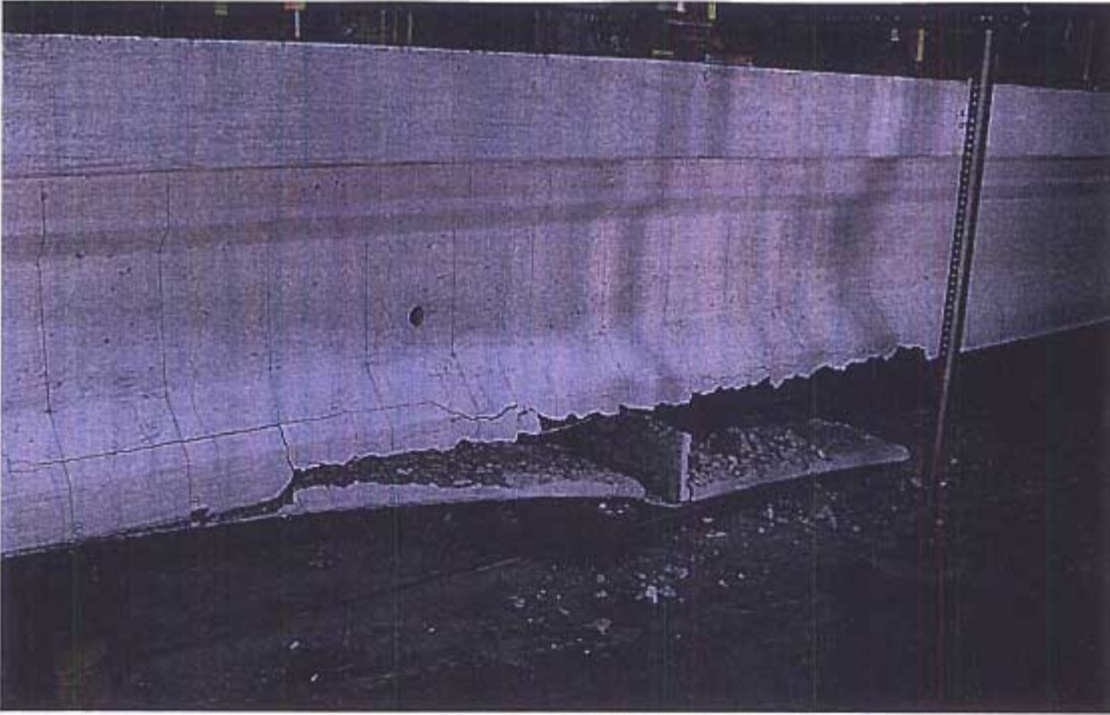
Test Specimen 3 at Failure Showing Concrete Cover Separation at South End
